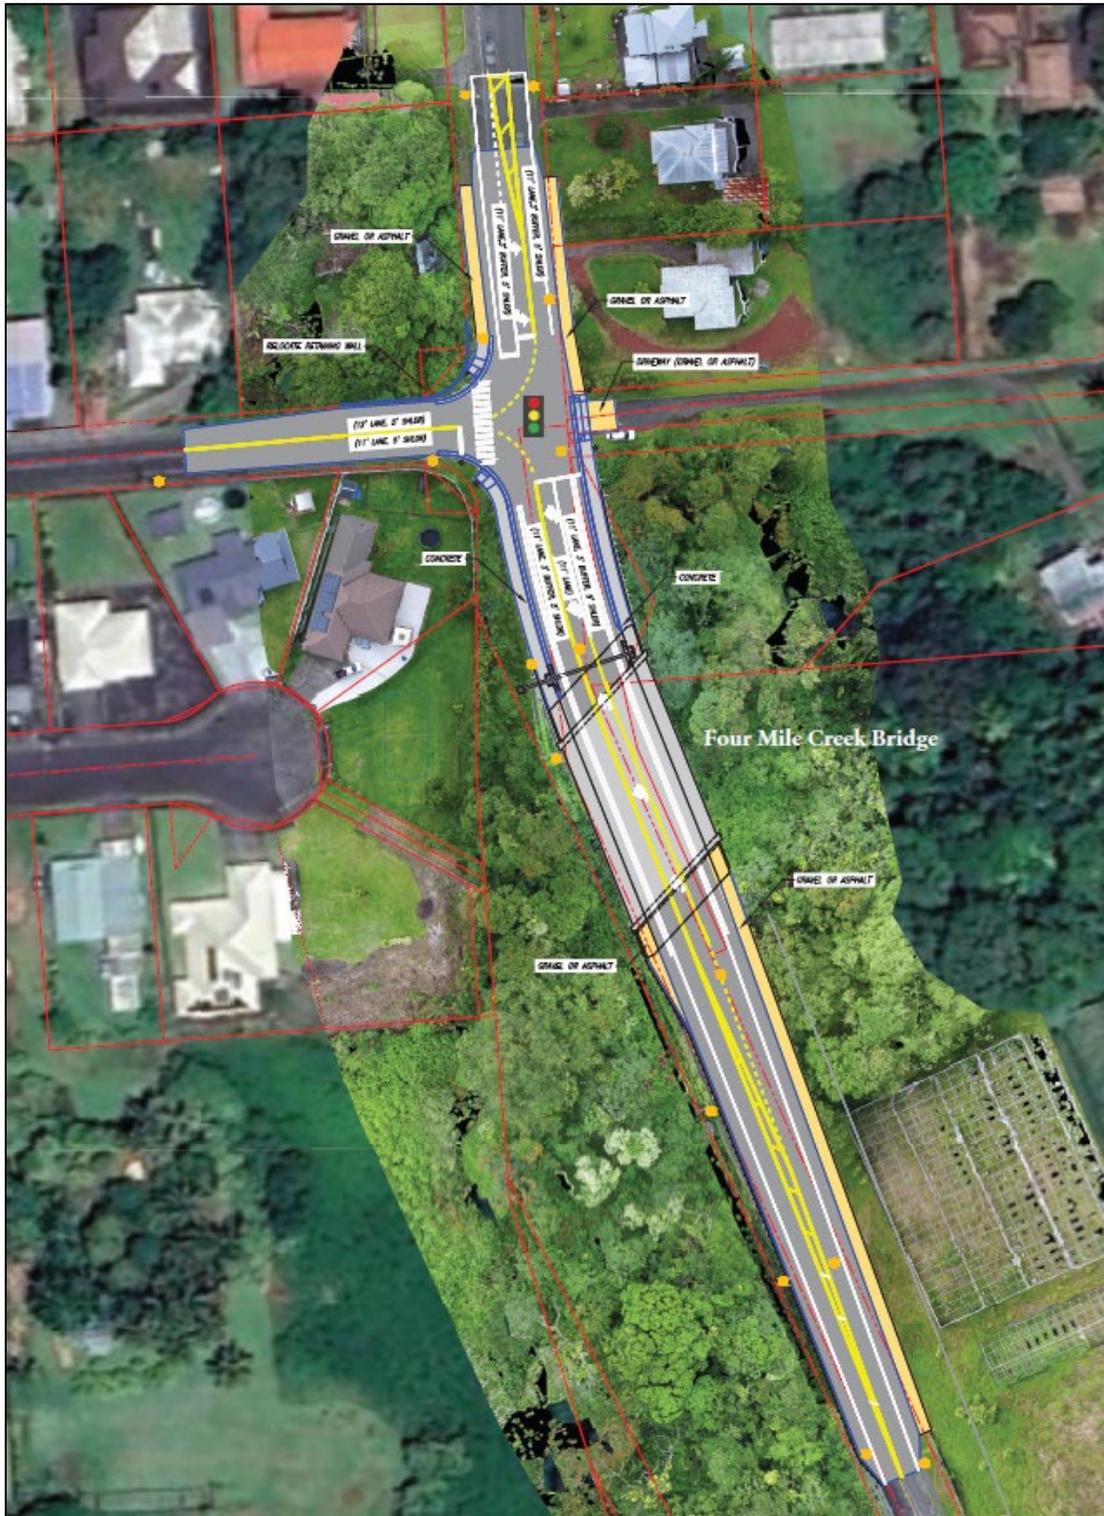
Schematic of the Proposed Action: Bridge Replacement and Widening with a Traffic Signal at the Kilauea Avenue and Haihai Street Intersection
